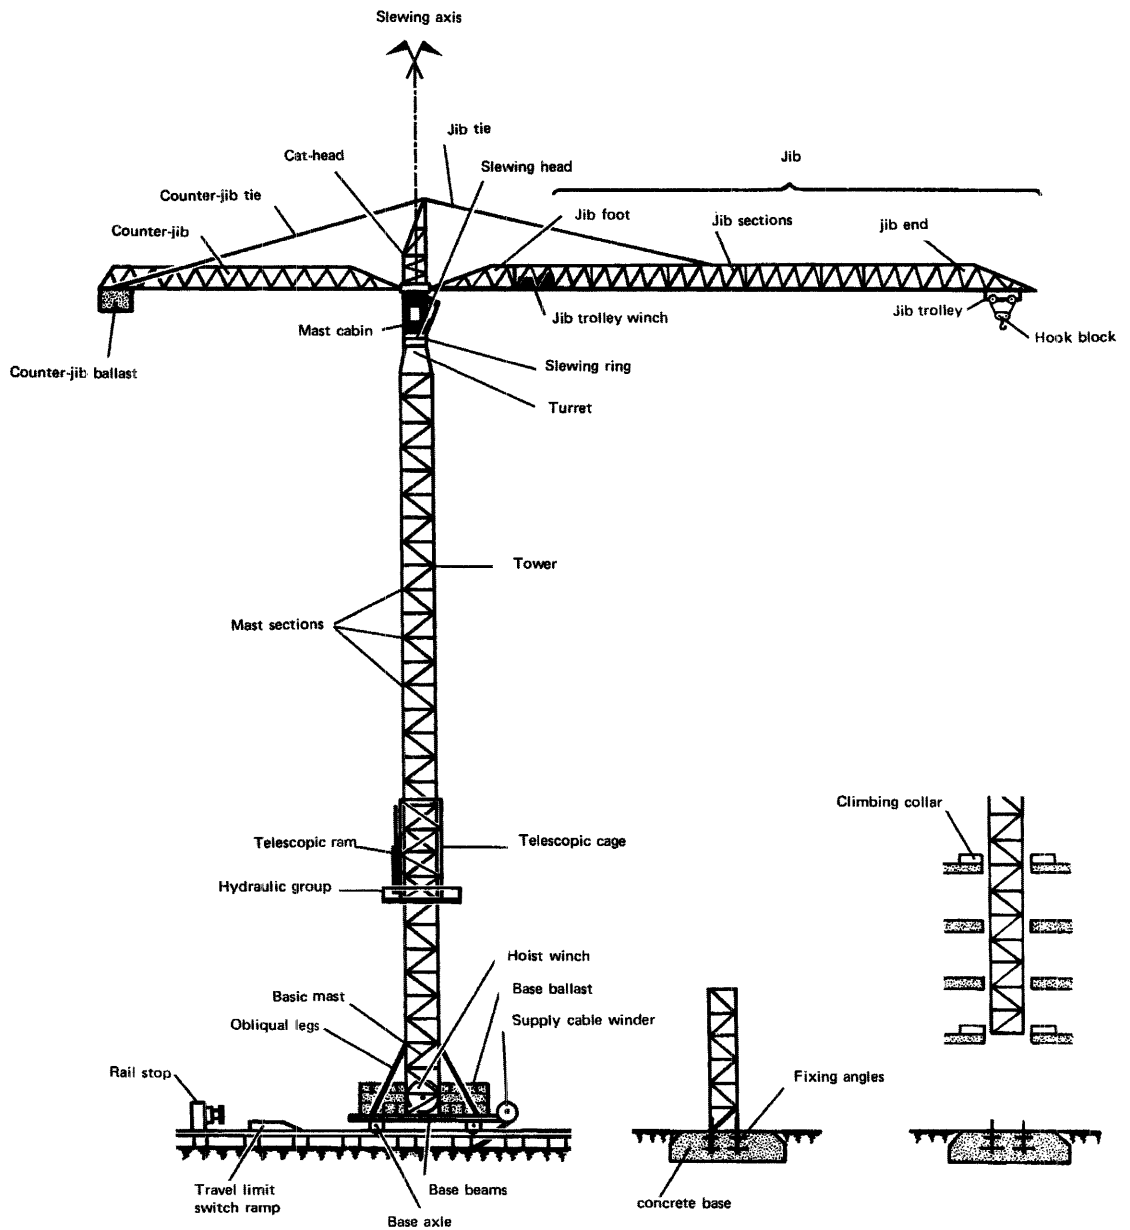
Terminology of a horizontal jib tower crane. (Courtesy of Potain Tower Cranes, Inc.)
